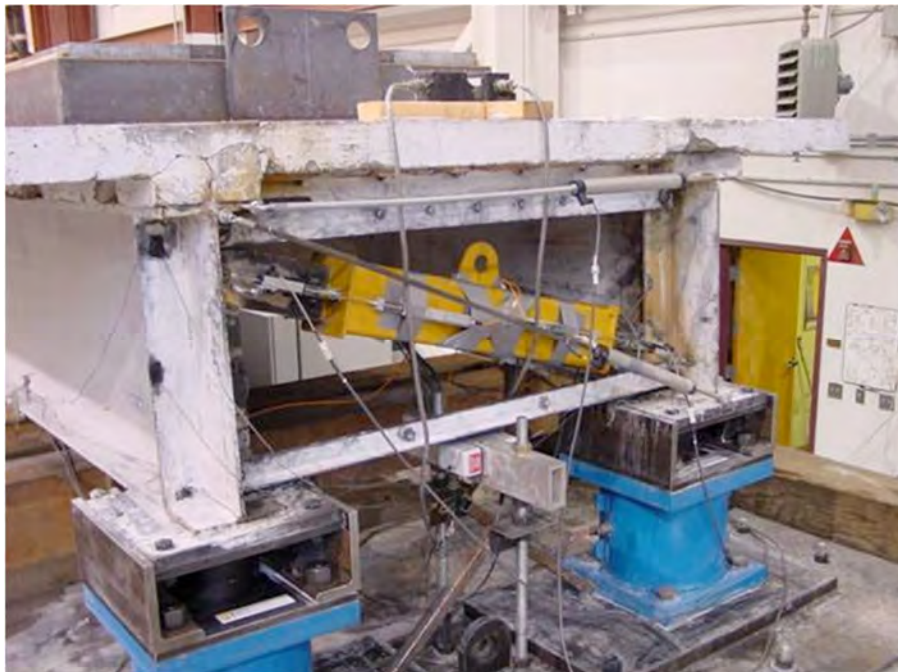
View of BRB at the End Cross Frame of the Plate Girder Bridge (<http://www.unr.edu/engineering/cee/faculty/itani/bridgeComponents.html>)
